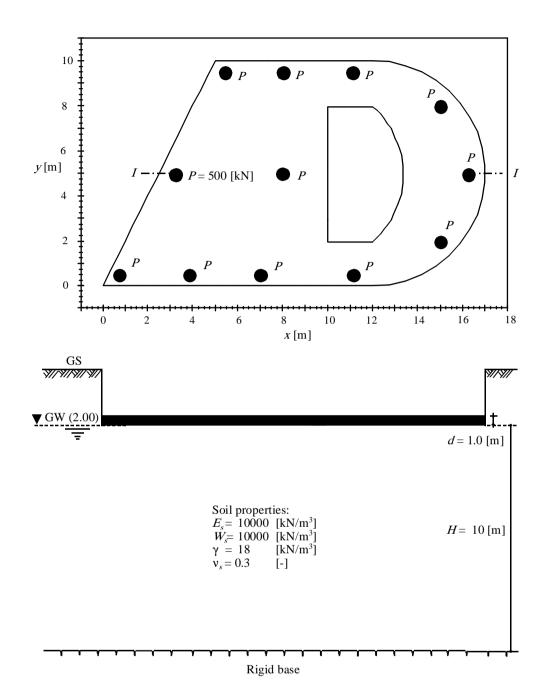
Plan and section elevation with raft geometry [m] and acting loads [kN]
